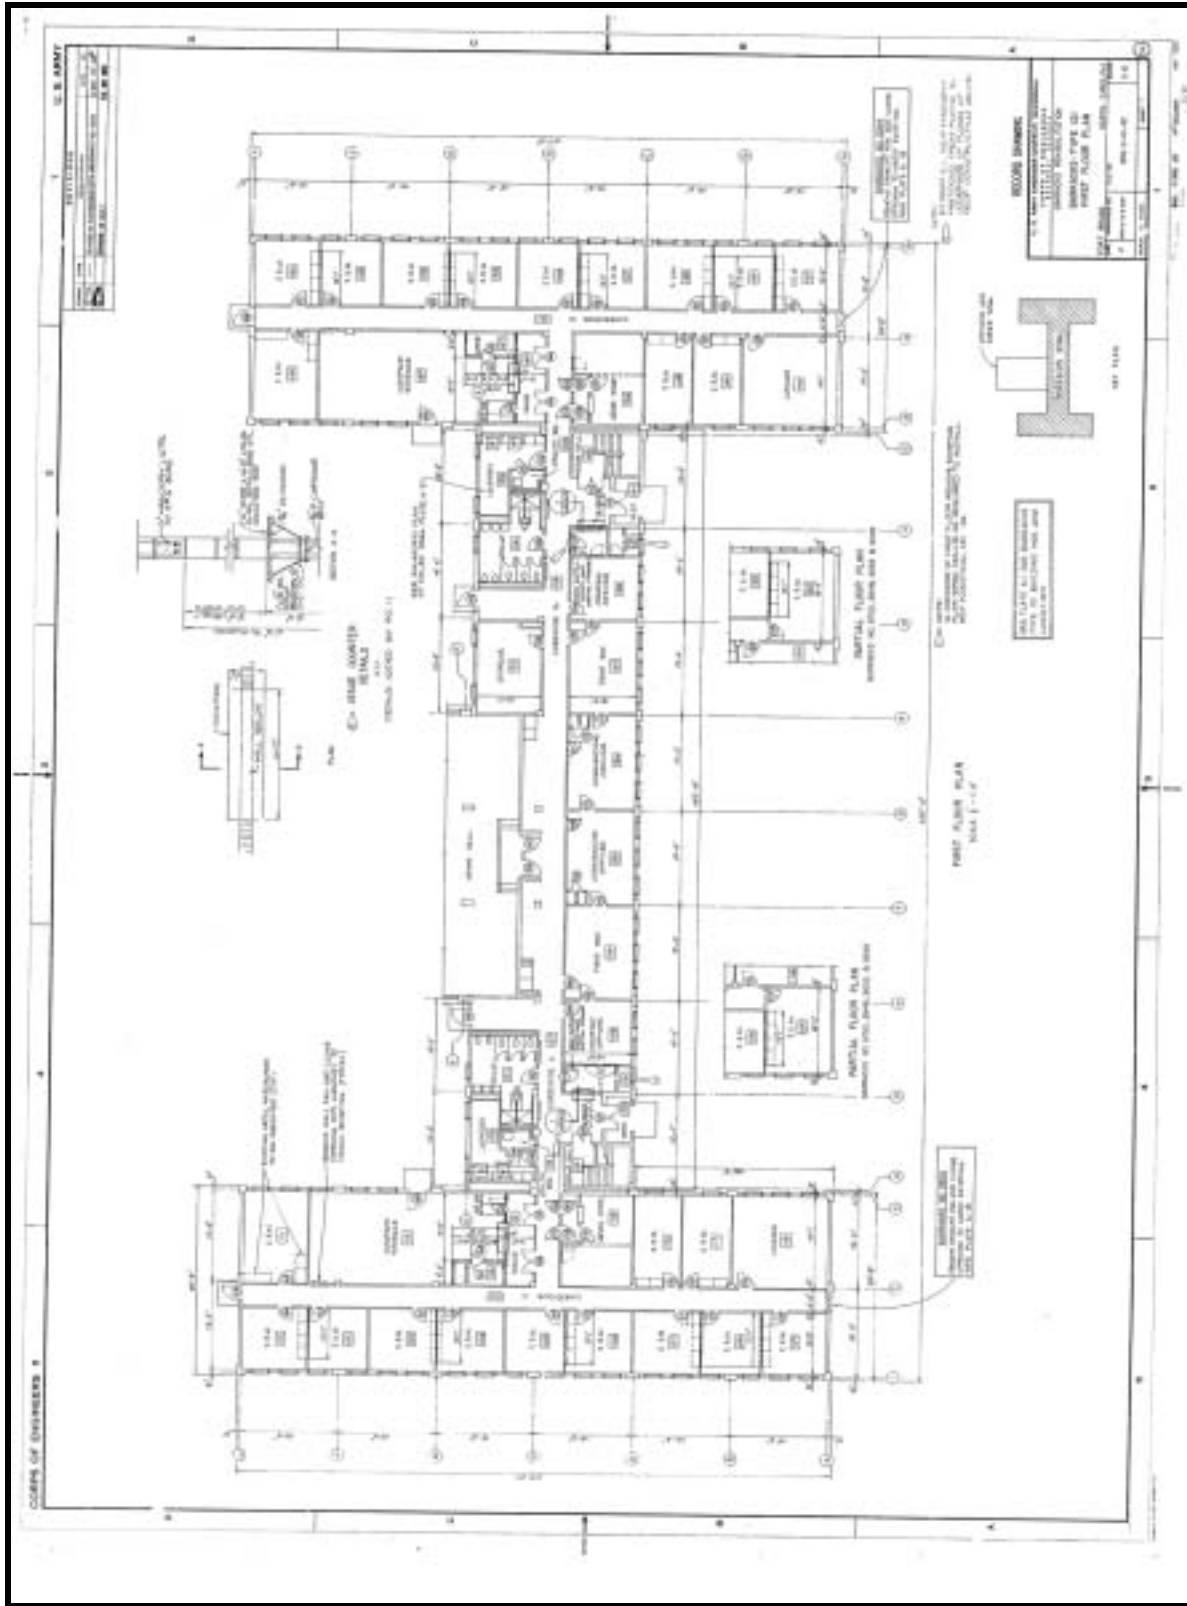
Renovated H-style, two-company barracks, barracks wing, first floor plan, Ft. Bragg (1972, revised 1974) (Engineering, Ft. Bragg).
